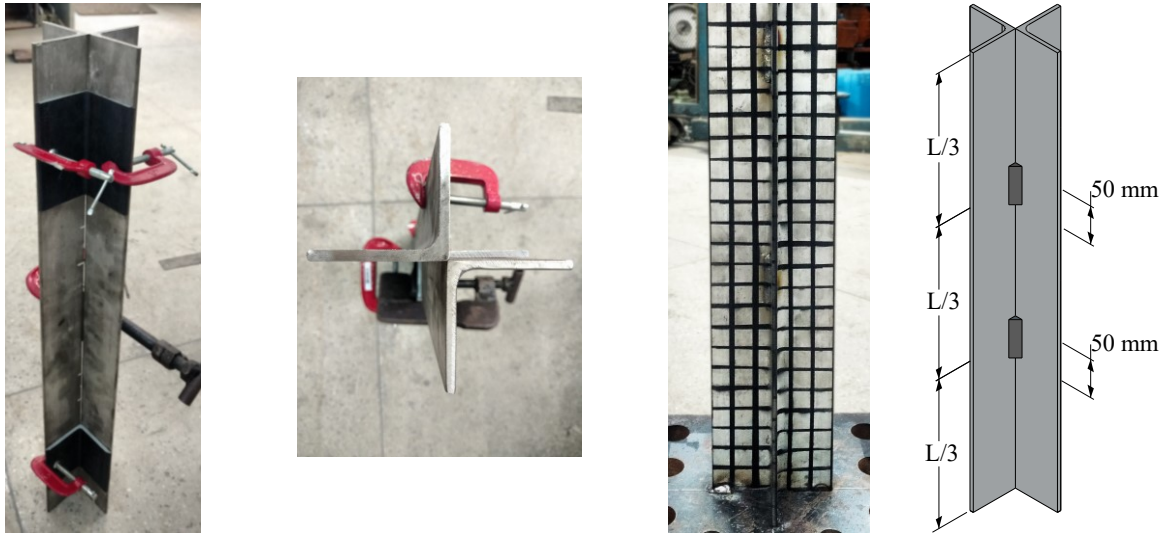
Column's layout procedure to create a welded starred cross-section [50].
